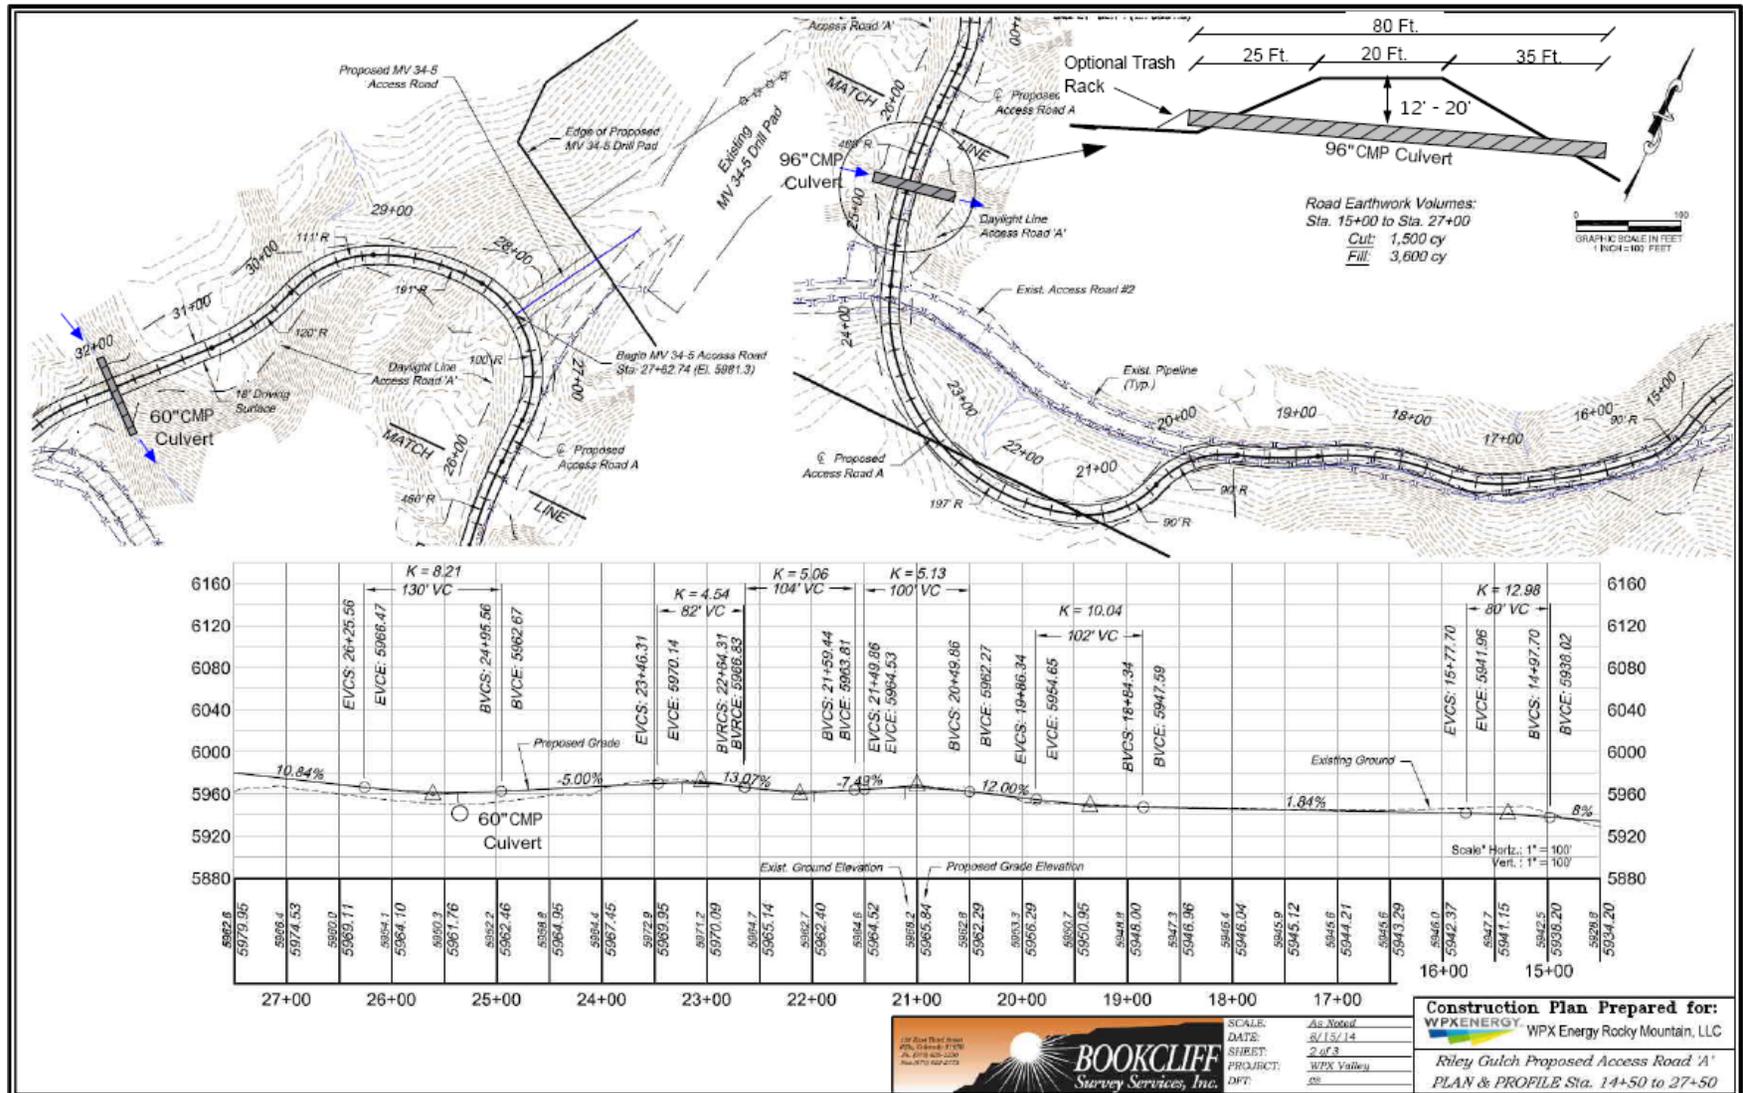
Phase 2 - Upper Riley Gulch Access Road Realignment with Major Culvert Installations
